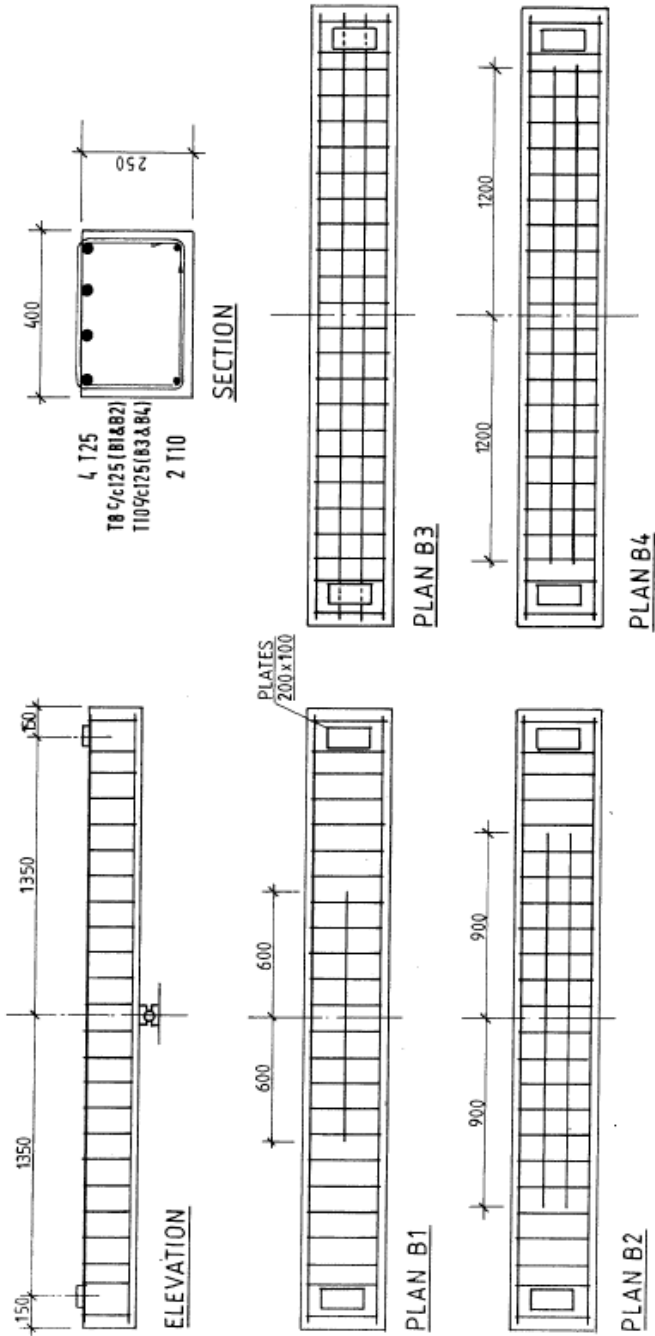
Tests Series B: Details of the specimen loaded close to the end sections.
